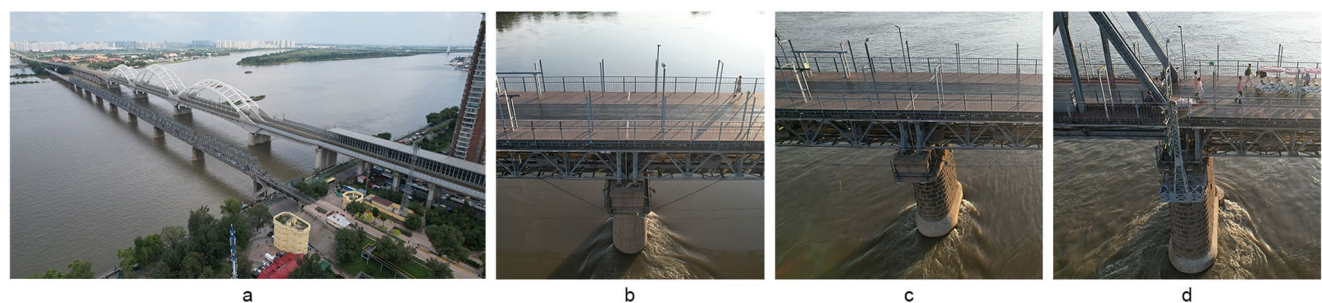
Condition of the remaining parts of the first Songhua river bridge: (a) Overview of the bridge on the Harbin-side; (b) Pier No. 3; (c) Pier No. 8 and (d) Pier No. 11.
